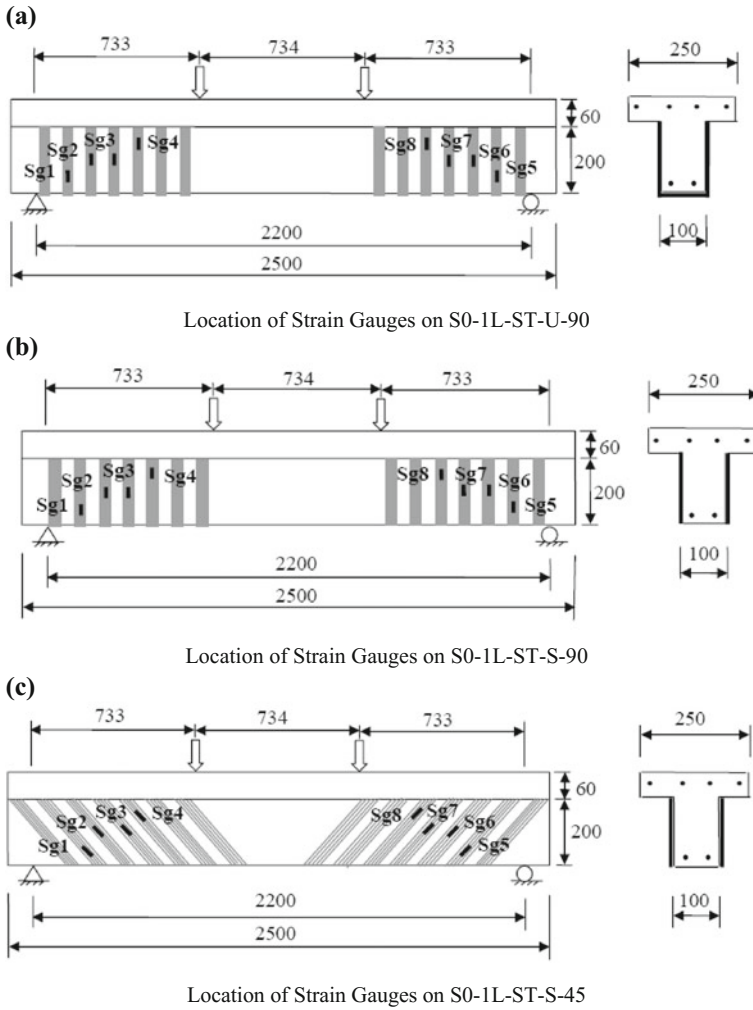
Details of surface strain gauge positions (GFRP strips)
